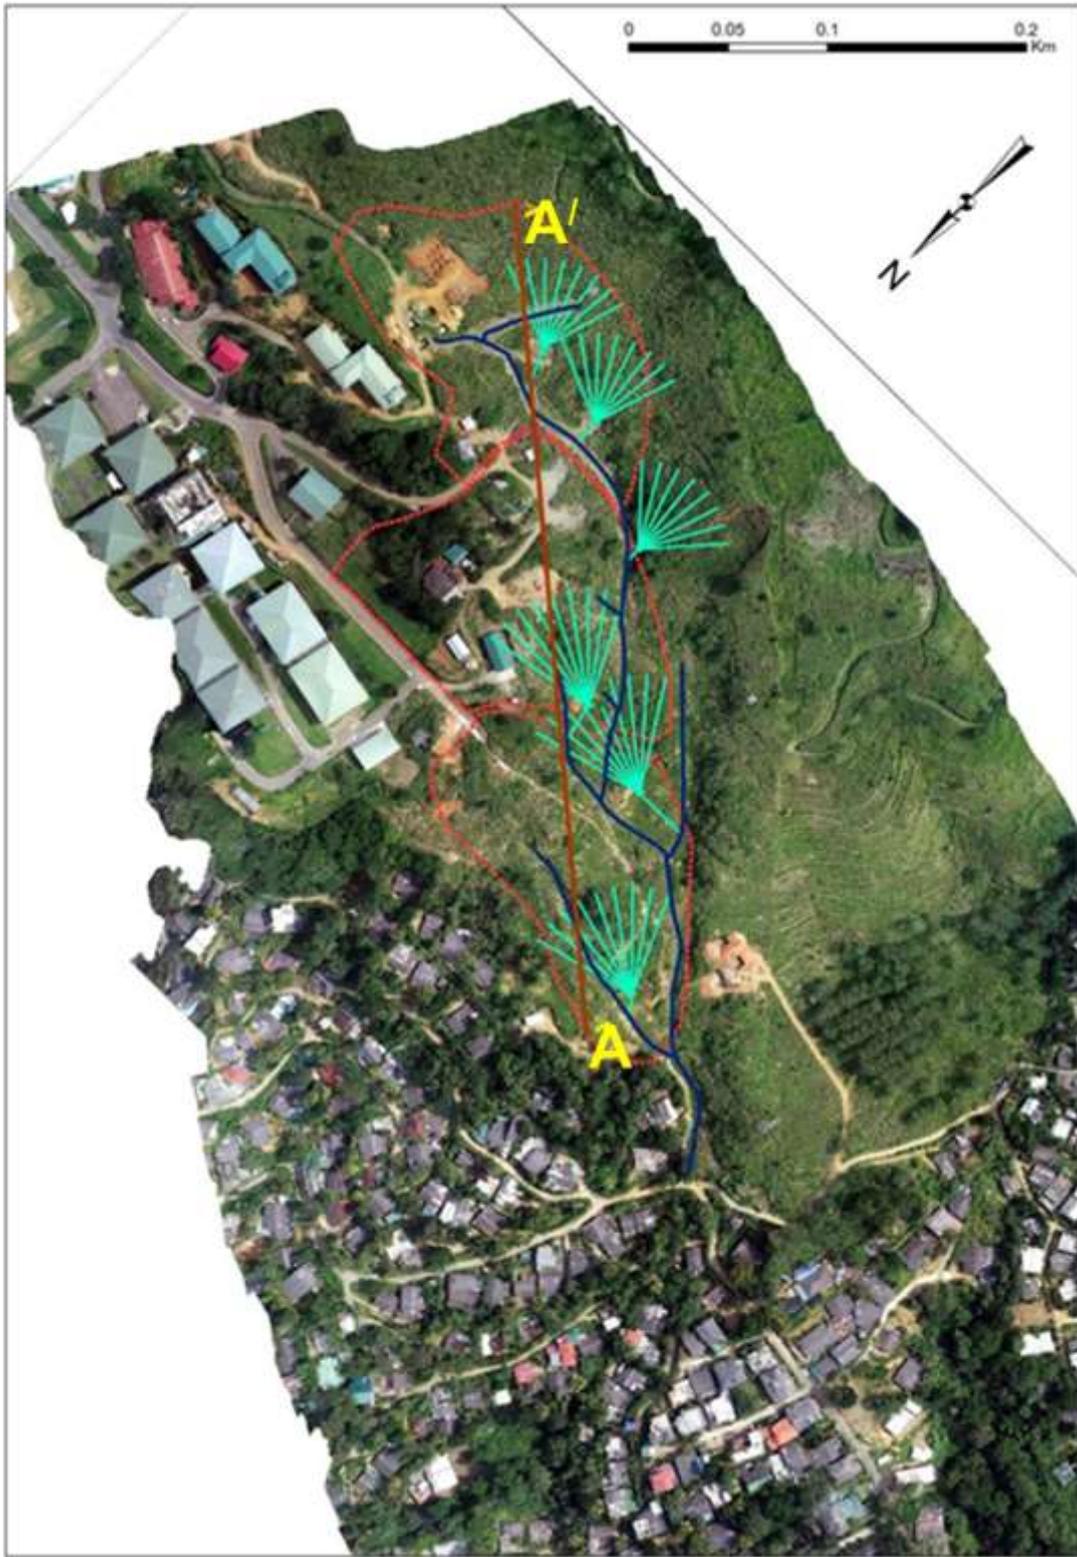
Layout plan of the existing surface and subsurface drainage network (marked in dark blue and cyan) overlaid on the proposed zonation map
